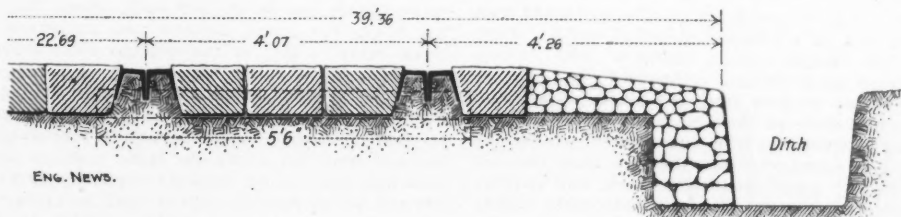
PART CROSS-SECTION OF ROAD WITH STEEL RAIL WAGON-WAY; VALENCIA AND GRAO ROAD, SPAIN.
